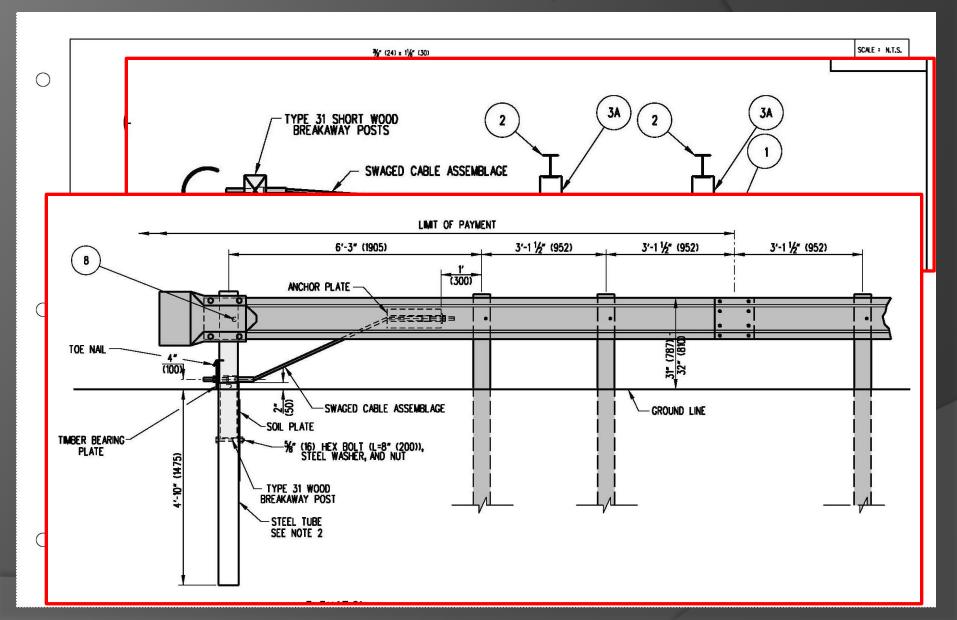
, SHEET 3 OF 3 GUARDRAIL APPLICATIONS (TYPES 1-31, 2-31, & 3-31)
